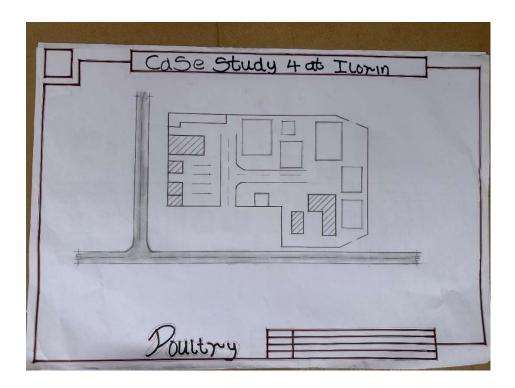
Poultry Farm Floor Plan of case study Four
